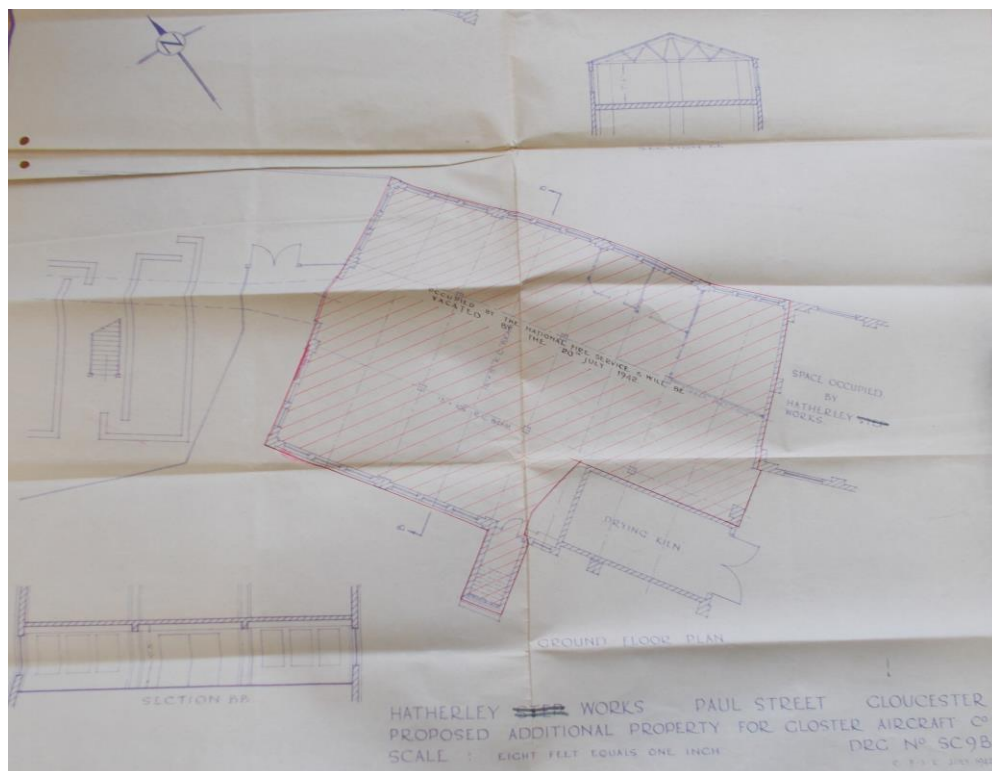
Proposed additional property for Gloster Aircraft Co. dated July 1942 showing ground floor plan of Building 3
